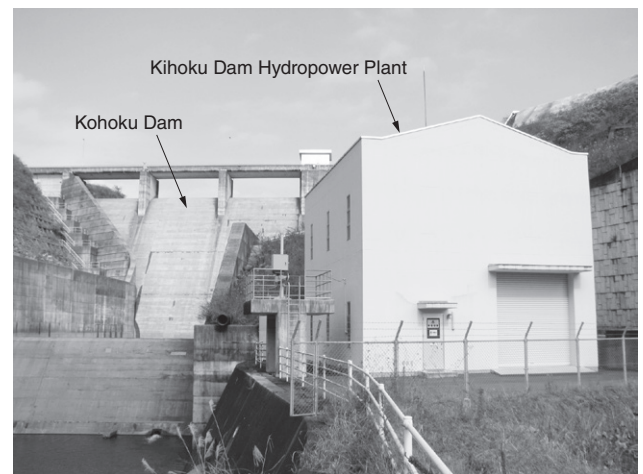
Kihoku Dam and Kihoku Dam Hydropower Plant
